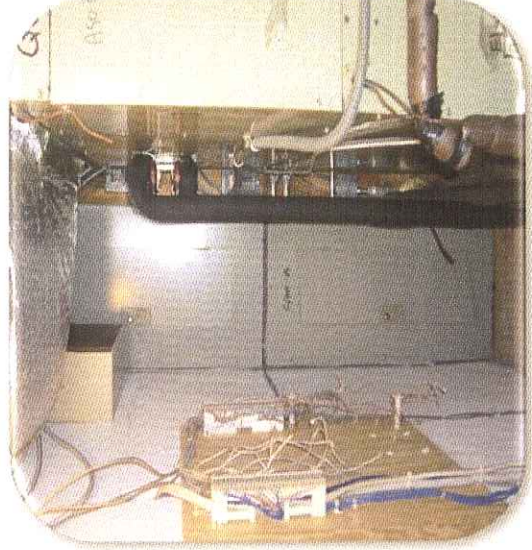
Electrical/Mechanical Equipment on 4th Floor -- HVAC equipment, in code violation, is blocking access to the panelboard.
